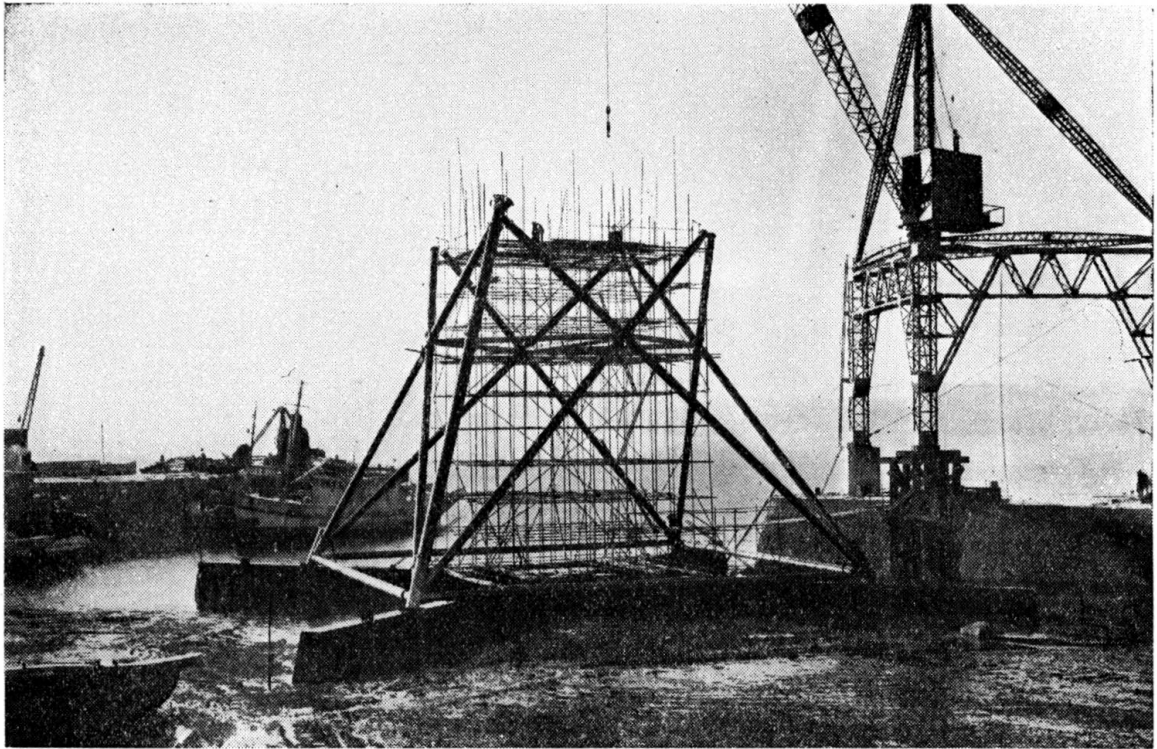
Tubular steelwork being assembled, by 15-ton derrick, on cruciform base girders in St. David's Harbour
